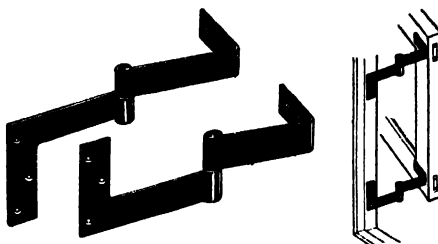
Special cranked hinged to allow the outside of casement windows to be cleaned from within
